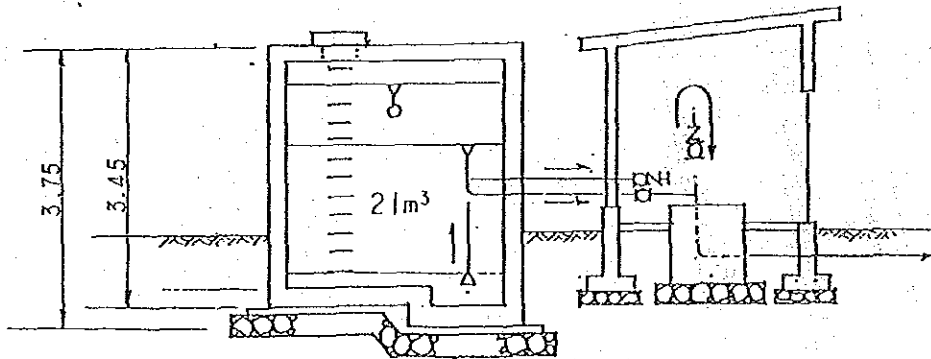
Plan and Section of Fire Extinguishing Equipment Installation
